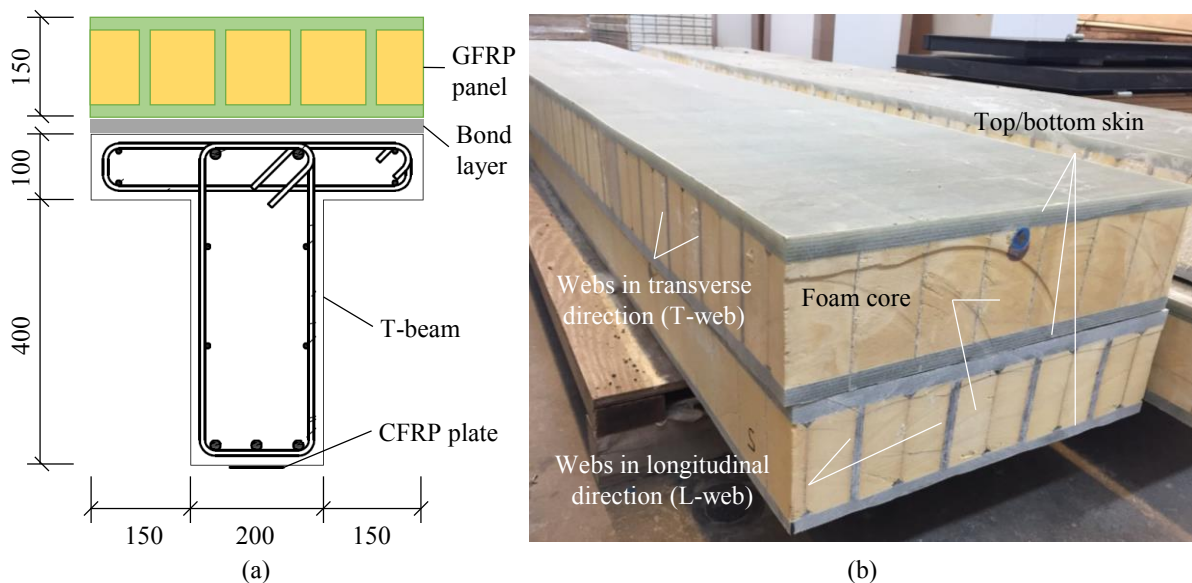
(a) Cross-sectional dimensions of the T-beam strengthened with self-anchored prestressed CFRP plate and GFRP panel; (b) Two configurations of GFRP panels with webs in the transverse direction (T-web panel) and webs in the longitudinal direction (L-web panel).
